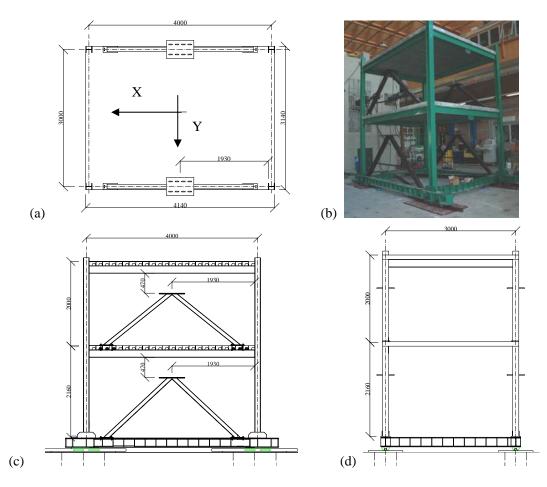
2:3 scaled steel frame built at the Structural Engineering Laboratory of the University of Basilicata in Potenza, Italy (Gattulli *et al*, 2007): a) plan view, b) 3D view, c) vertical plane XZ, d) vertical plane YZ.
